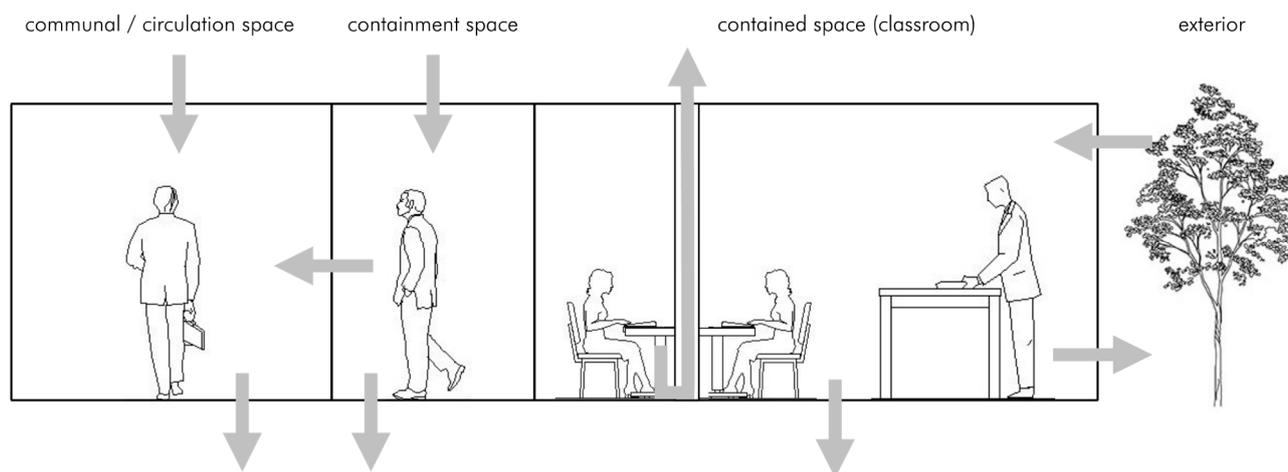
Conceptual model of school or office layouts with extractive vents over workspaces.
